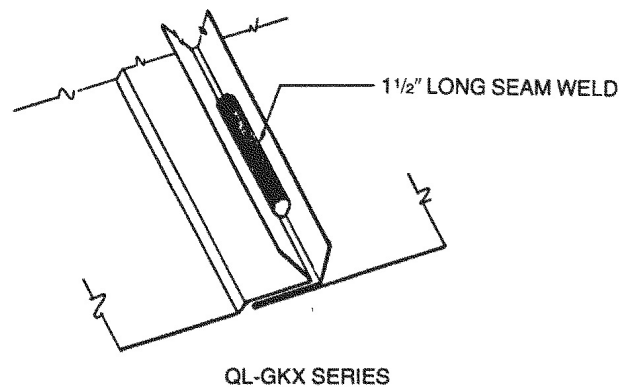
b.—WELD AT SIDELAP
